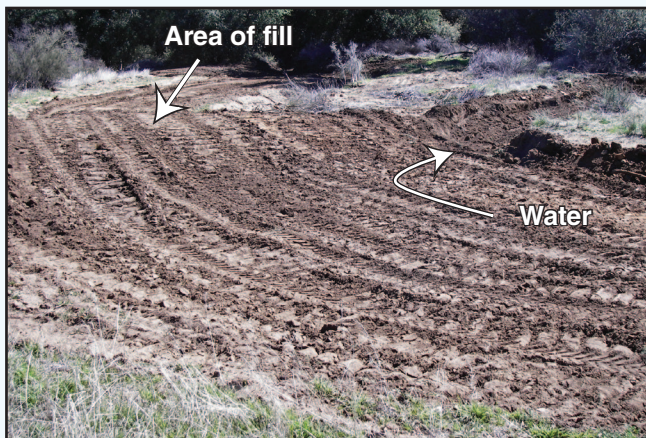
Rolling grade dips are constructed to direct water off existing trails.
